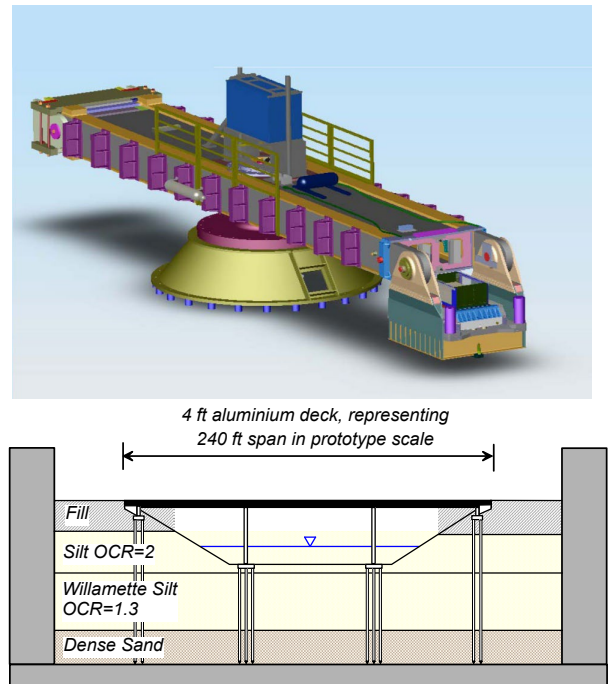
(left) 9-m geotechnical centrifuge at UC Davis (source: Center for Geotechnical Modeling at UC Davis), (right) Proposed model of a full bridge supported on piles in liquefiable soils.
